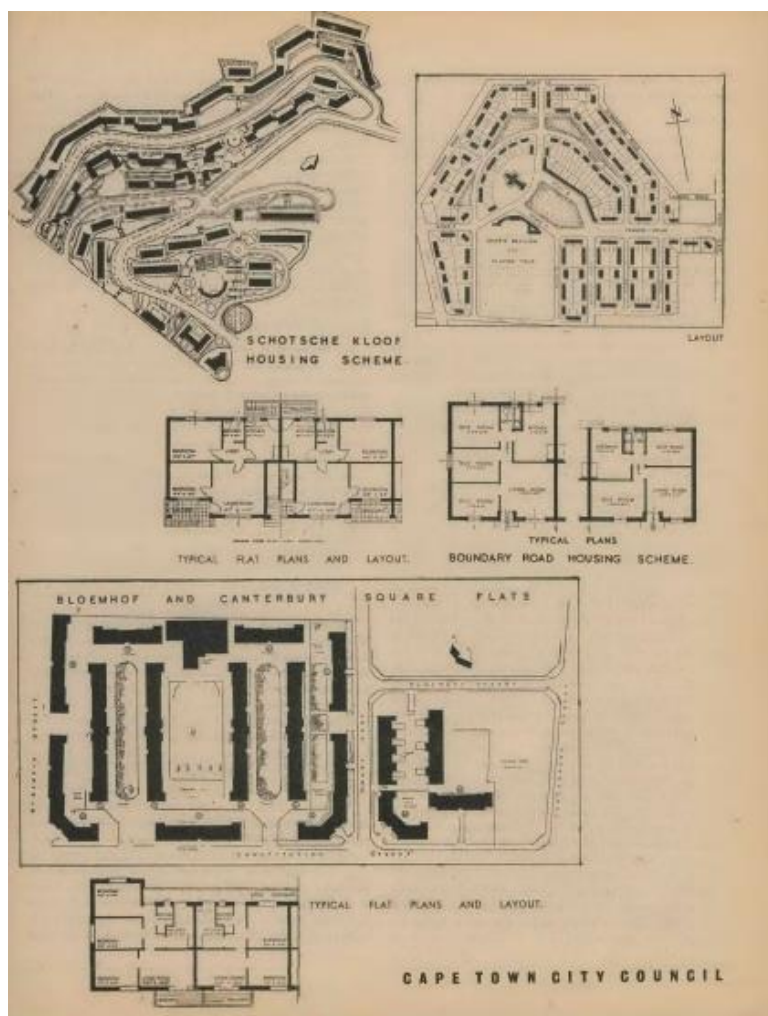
The floor plans and layouts for the Schotschekloof, Boundary Road and Bloemhof Street flats. The lower section of the Schotschekloof flats was never built and remains a greenfield site. The Boundary Road development consists of both housing and flats arranged around open spaces. The Bloemhof plan, by far the most urban of the sites, allows for courtyard spaces. The units are four-roomed with balconies. (SAAR, June 1943, 129)
